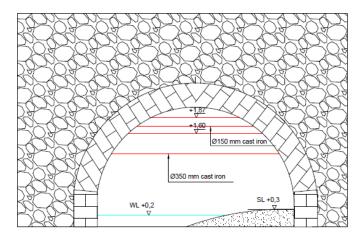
Pipe Crossing Whitechurch Road Bridge (Area 3 and 4)
